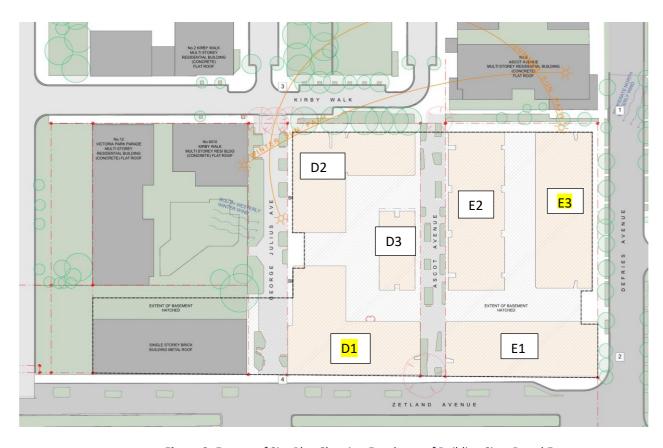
Extract of Site Plan Showing Envelopes of Building Sites D and E
